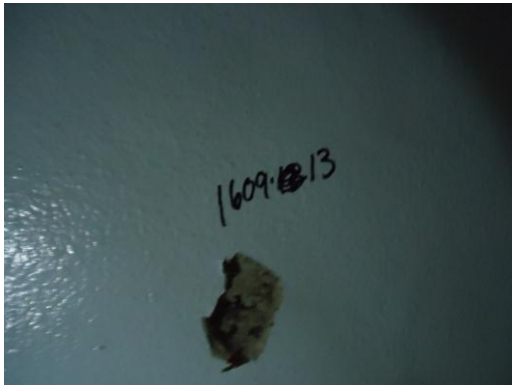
Wall Plaster (1609-13) Room 5 South Wall. No Asbestos Detected.
